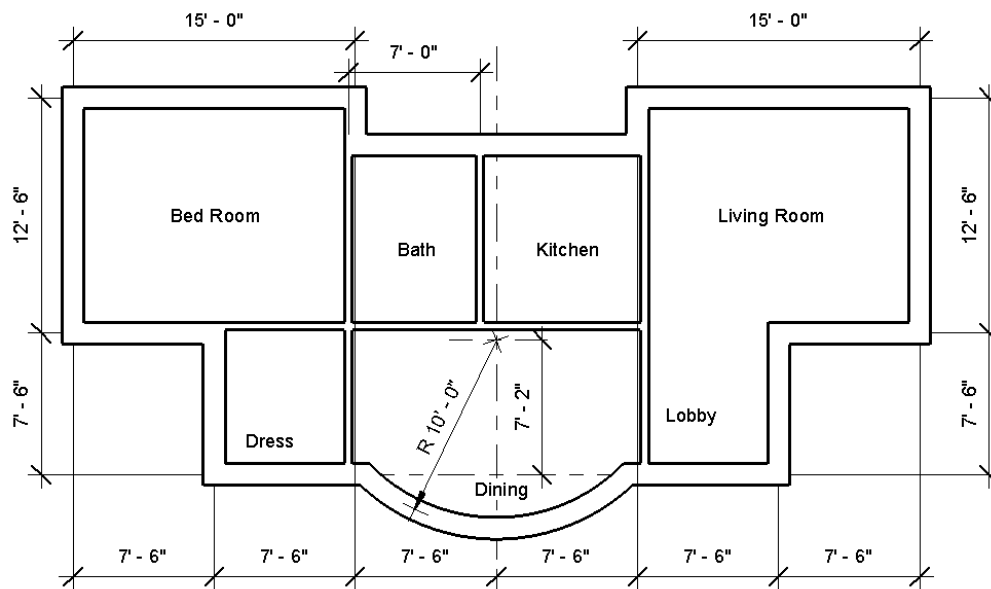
The sketch plan for creating the exterior and interior walls for the Apartment 2
